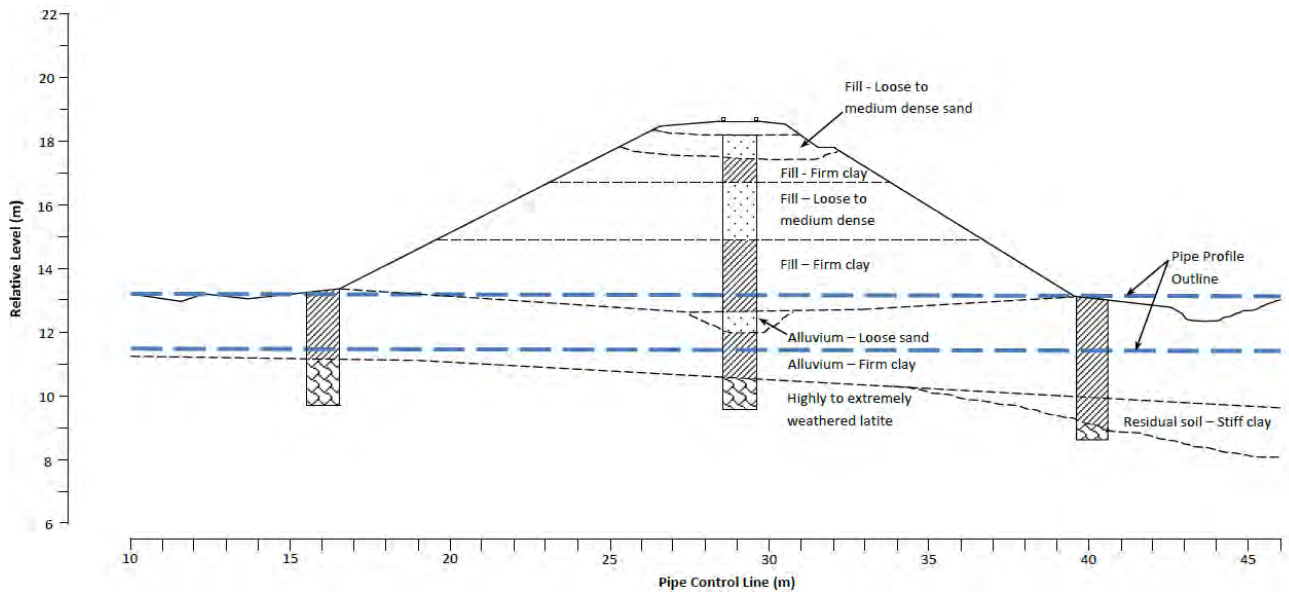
Gerringong Bypass Belinda Street Culvert C4480 embankment cross section.
